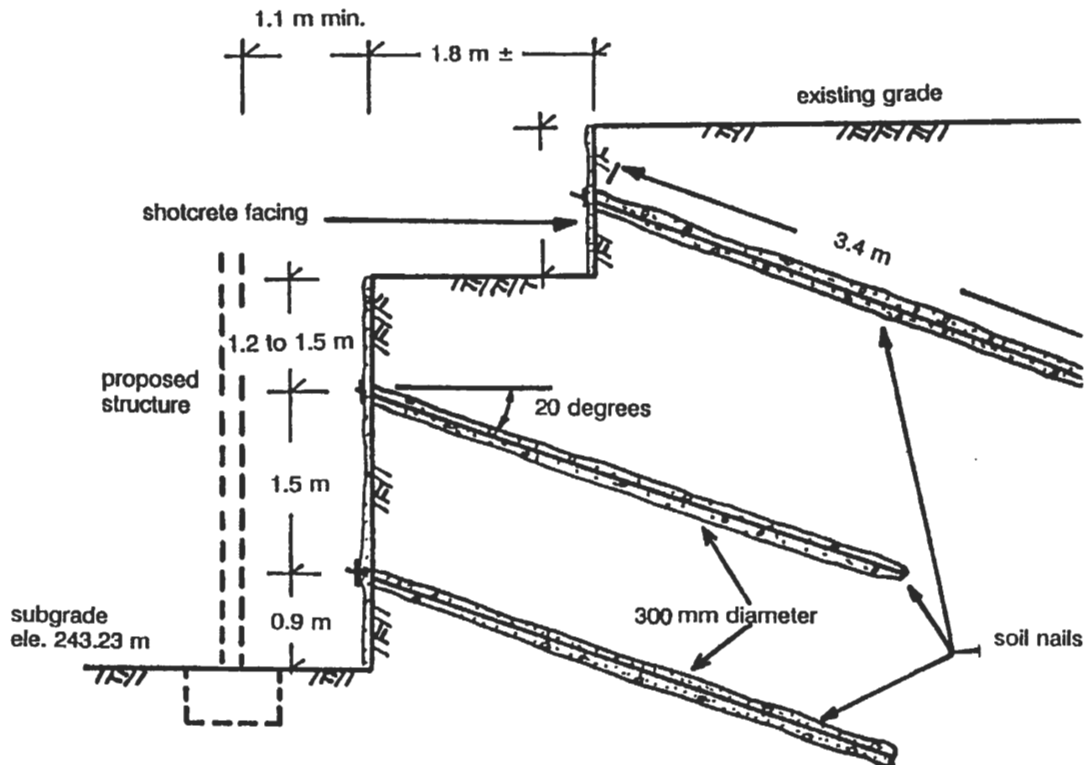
Cross section of a soil-nailed excavation for a building constructed in Santa Cruz (UCSC wall), Calif. (Felio and others, 1990).
